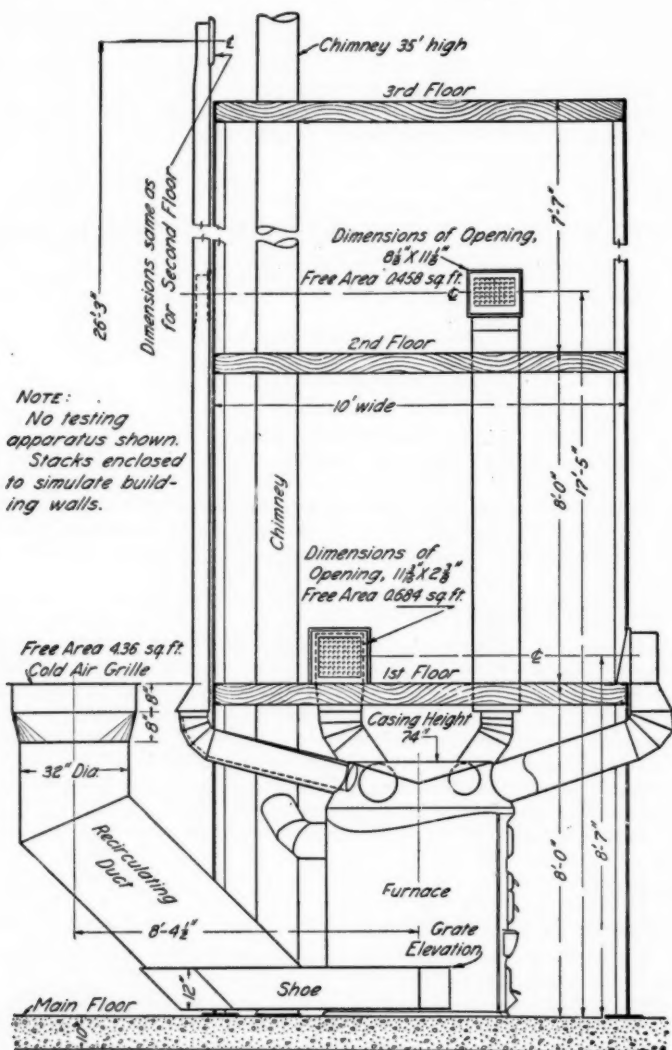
SECTIONAL ELEVATION OF THE PIPED FURNACE TEST PLANT
